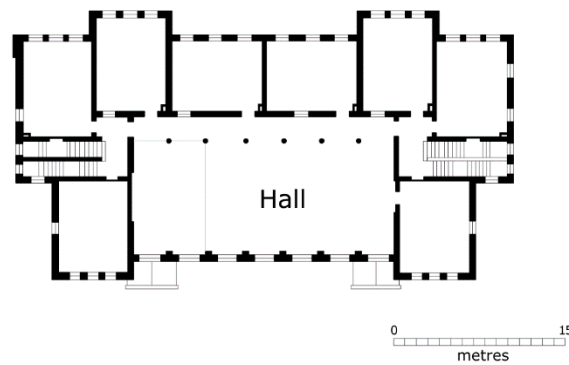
Layout plan of the Jonson Street School, Hackney, with the central hall (right © Feilden Clegg Bradley Studios)
